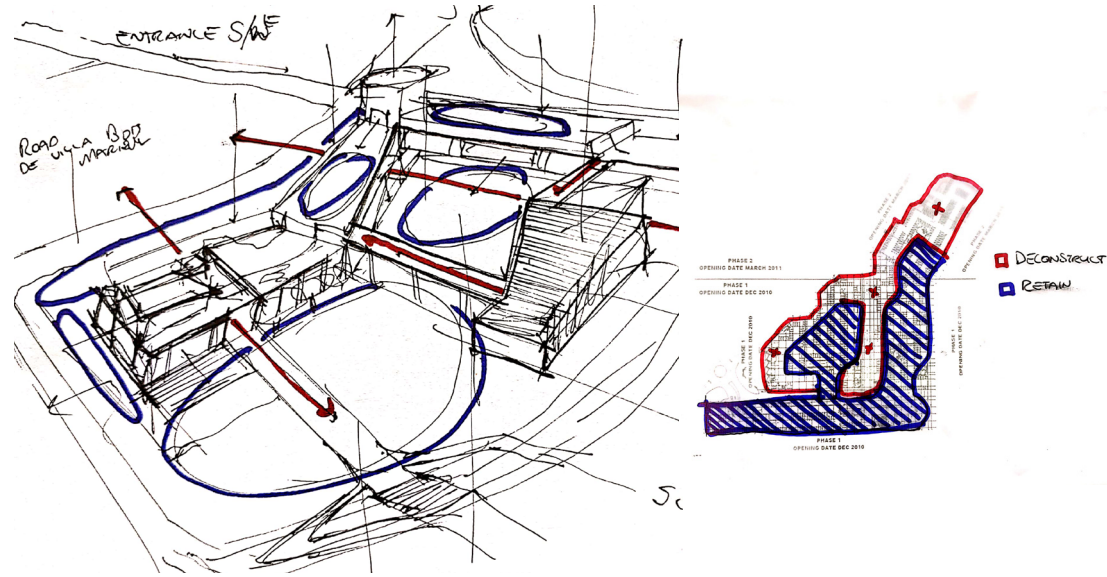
DECONSTRUCTION CONCEPTUAL APPROACH (AUTHOR 2021)
